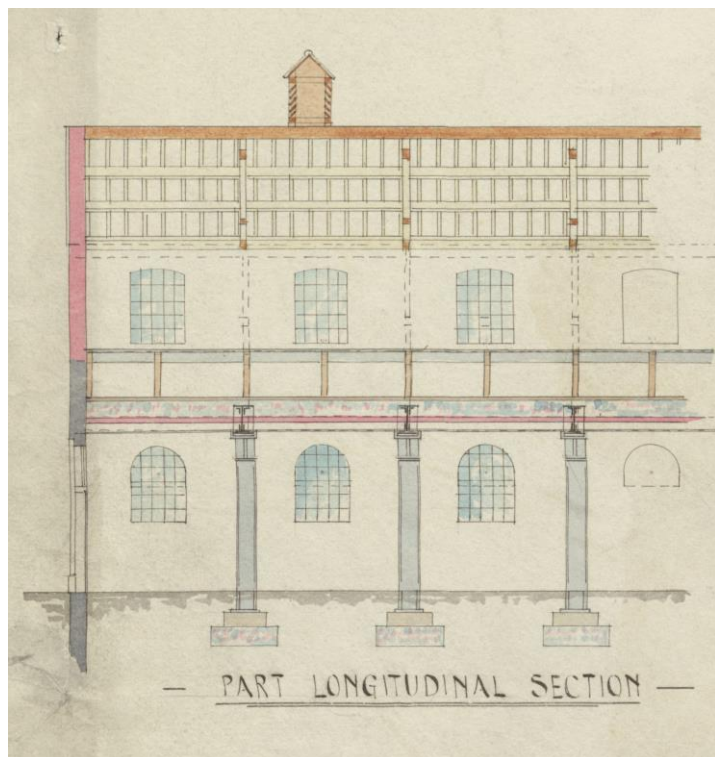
Detail of drawing. Long Stable - Longitudinal Cross Section.
